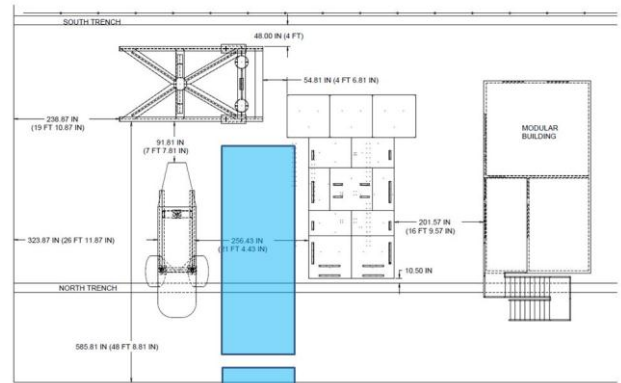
Plan B: Alternative arrangement that shows the configuration of all the parts if the steel plates are not installed in time.
